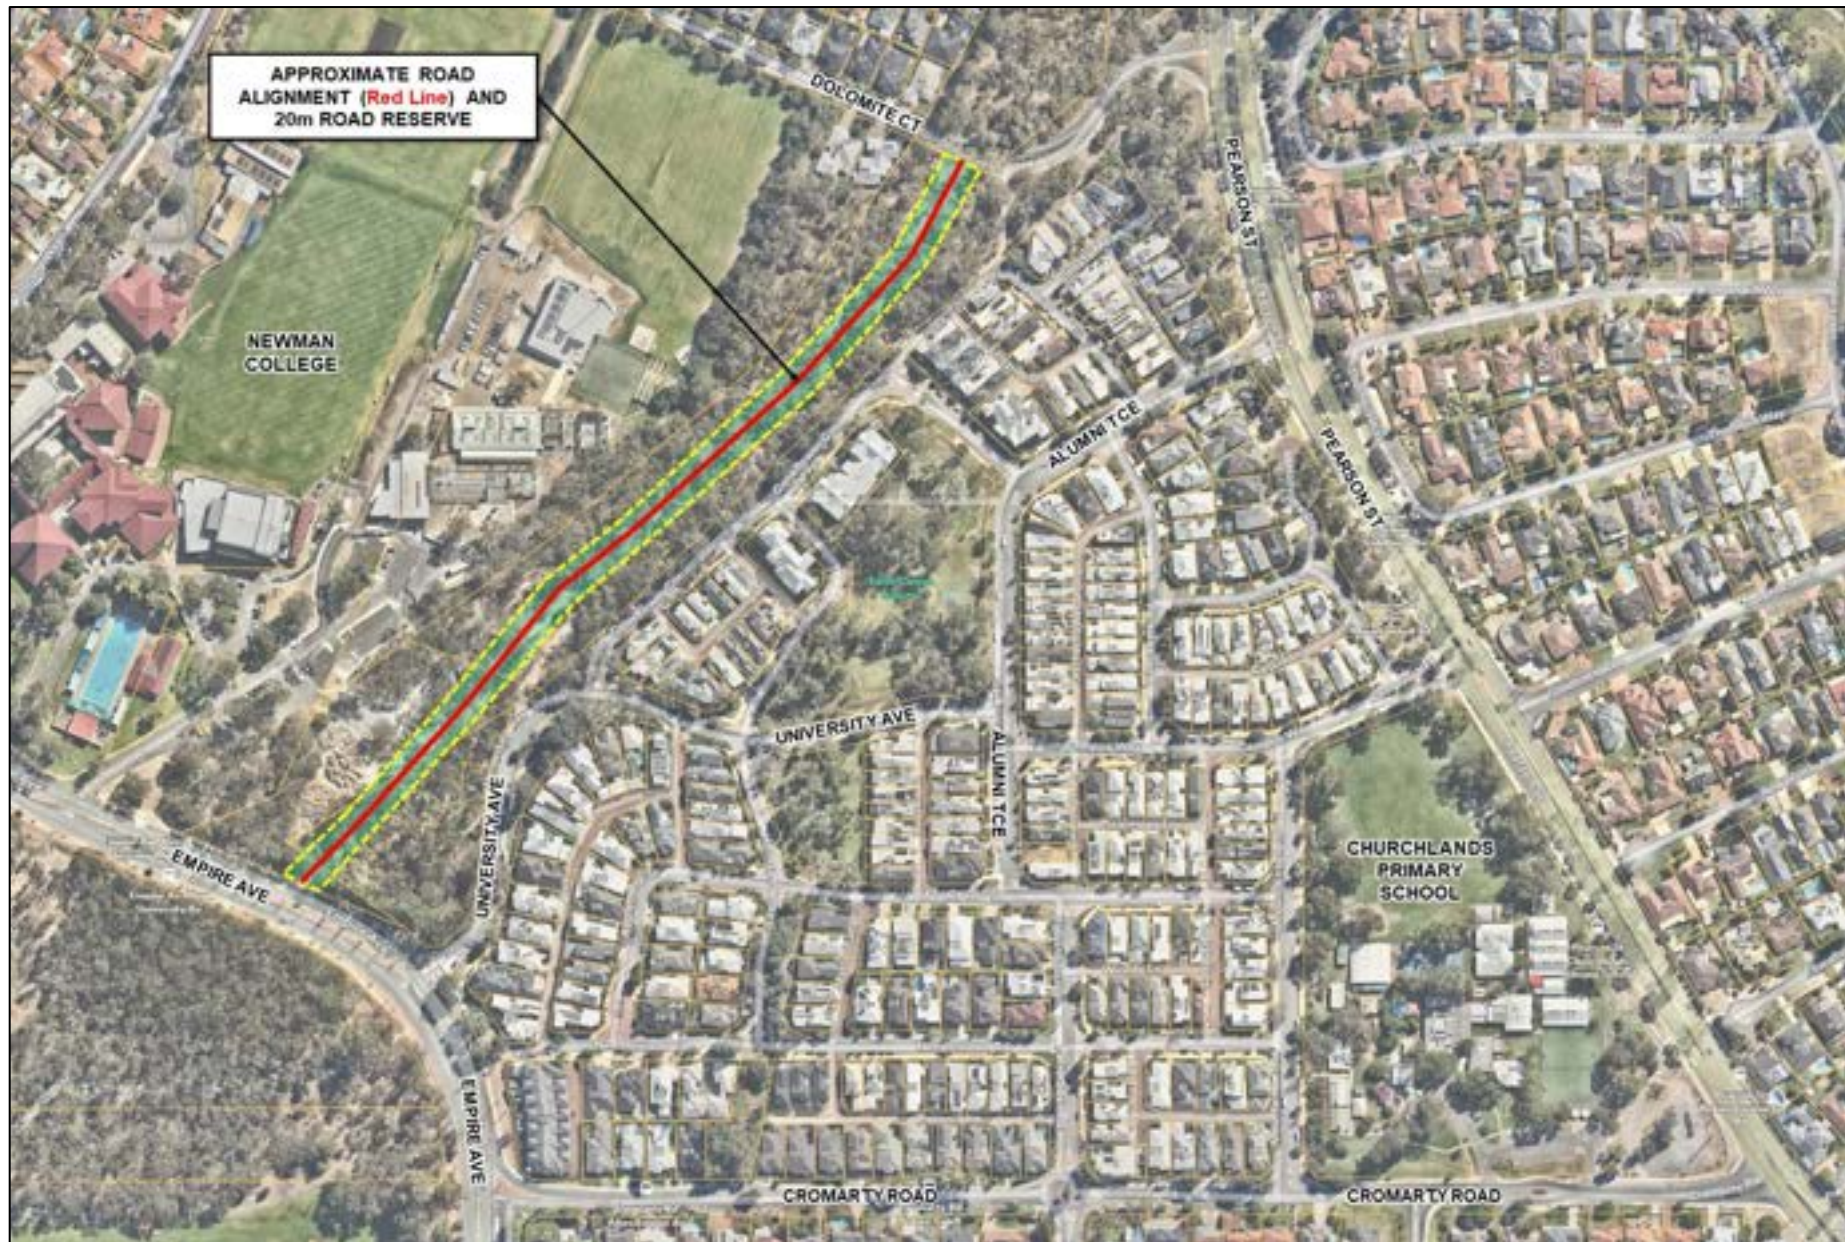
Approximate road alignment and extent of 20m road reserve for a Local Connector Road.
